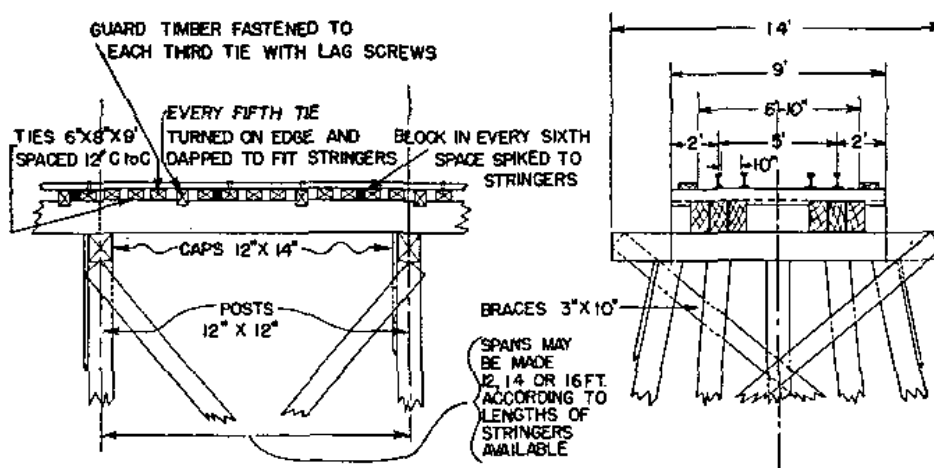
Floor system for standard gage railway timber or pile trestle.
